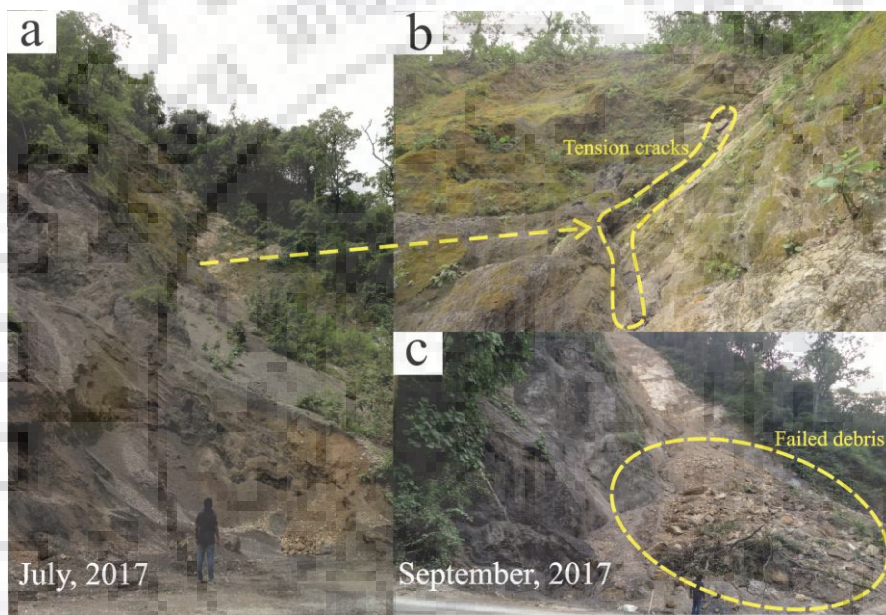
Road cut debris slope at location L1 near Shivpuri township along NH-58 (a) Without installing retaining wall, debris were excavated from toe portion of slope contributing towards disequilibrium in the stability of slope (b) Tension cracks at crown portion are indicating possible zone of initiation of failure and formation of algae is addressing moist condition which may also act as lubricant during failure (c) Post-failure photograph showing massive landslide along cut slope near Shivpuri township
